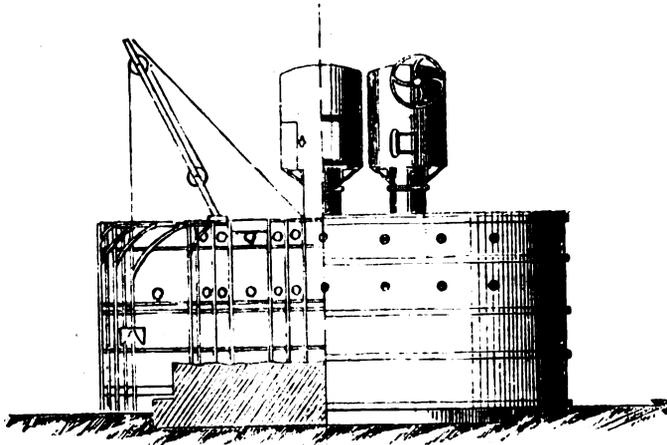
HALF LONGITUDINAL SECTION AND ELEVATION.
